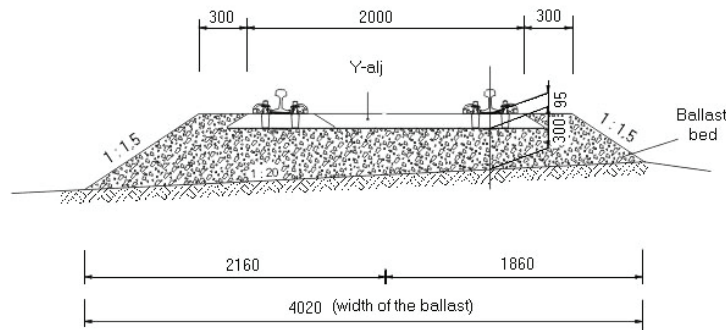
A typical cross-section of the track with Y-shape steel sleepers
